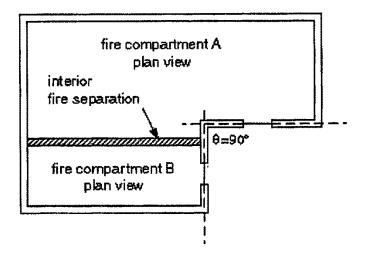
A. Openings in walls at a right-angle corner
